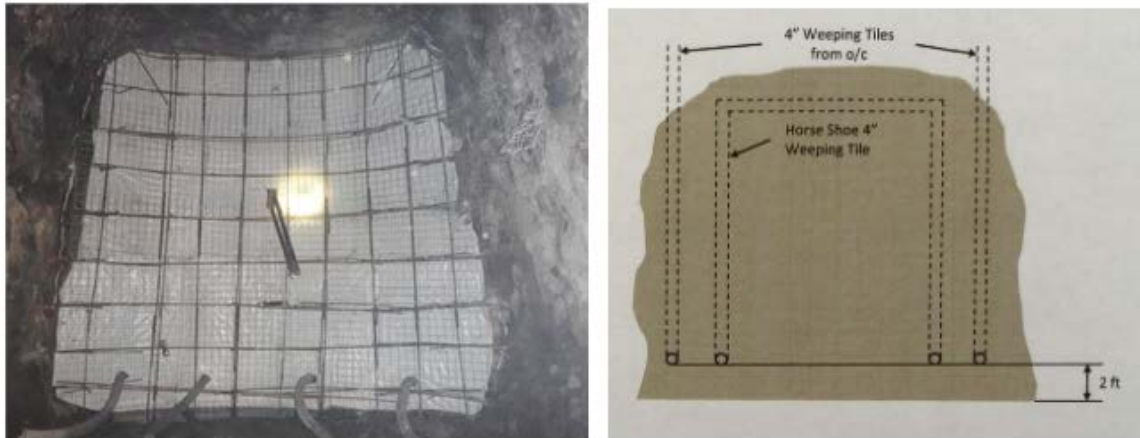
In situ photo of the steel frame of a shotcrete wall with weeping tiles and reinforcements
